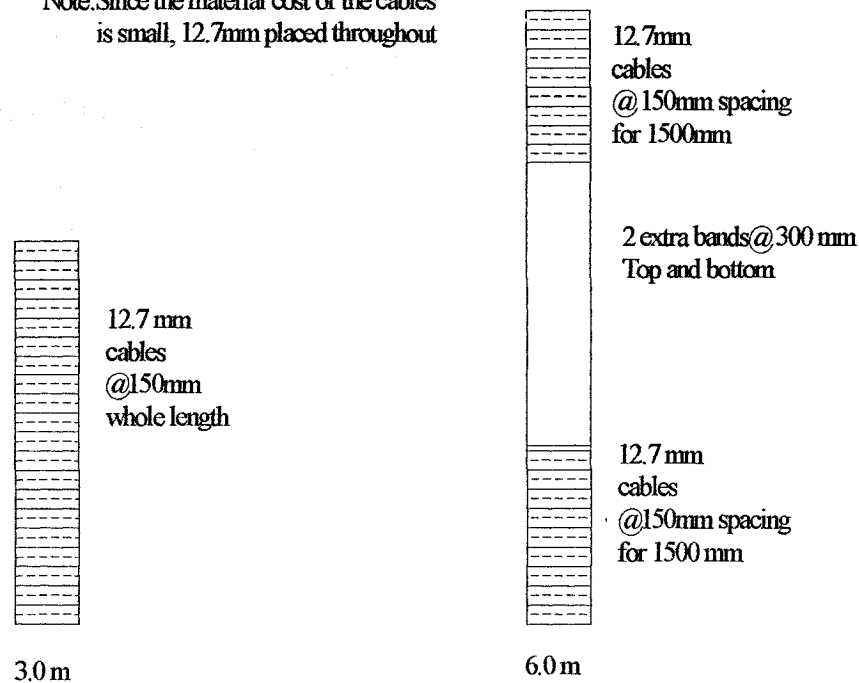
Details of Retro-belt design for 1000 mm circular columns with 3.0 m and 6.0 m lengths
